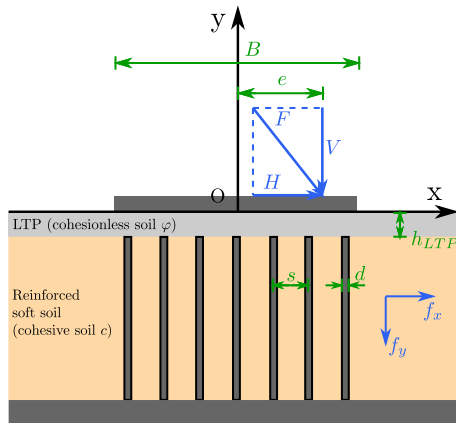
Studied configuration: strip foundation on reinforced soil by RIs.
